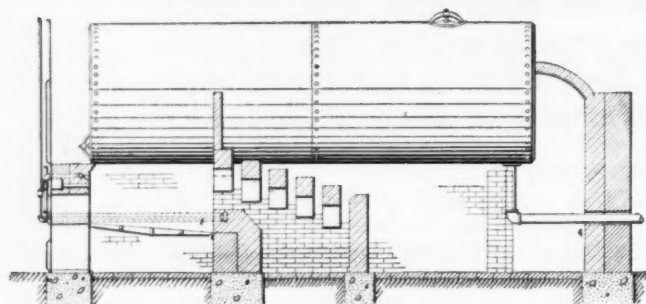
ONE OF THE FANCY FURNACE DESIGNS WHICH SHOWED A SLIGHT IMPROVEMENT
